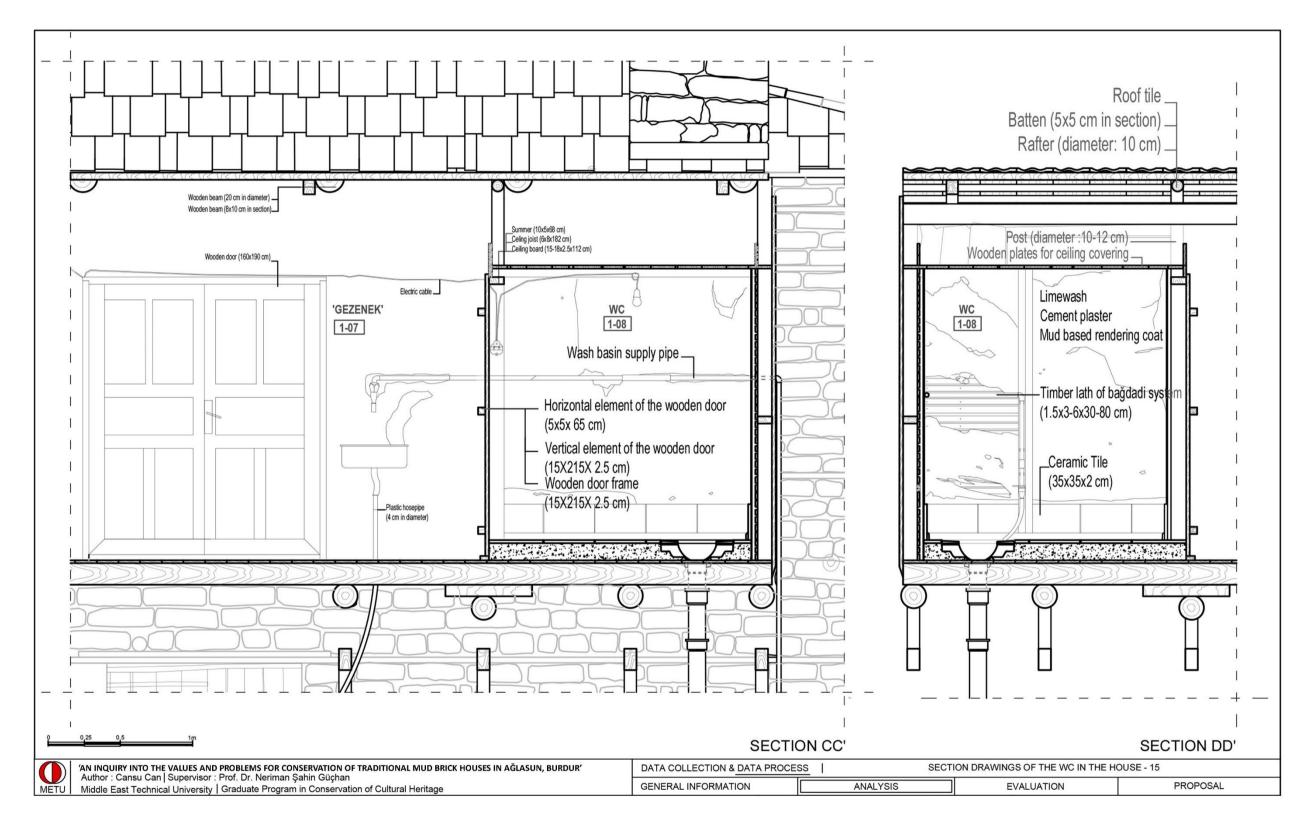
Section CC' and Section DD' of the WC of the House-15.
